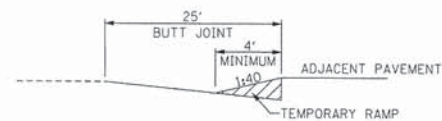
DETAIL OF PAVEMENT REMOVAL AND REPLACEMENT SPECIAL
